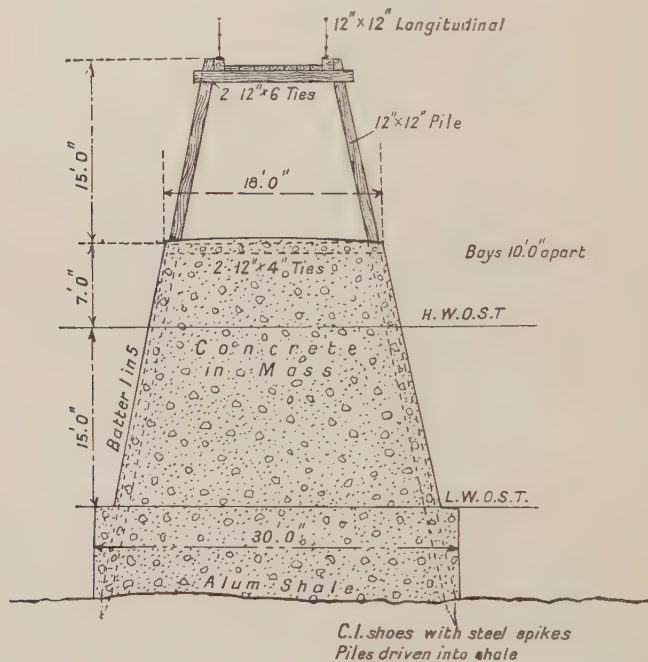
Whitby Harbour. Section of New Entrance Piers.
